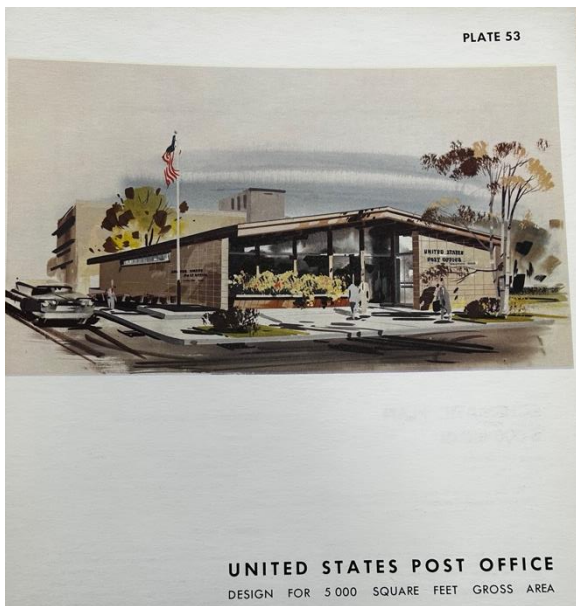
Thousand Series design drawing from Building Design Guidelines. Design 53 is distinct from other design plates at it is one of the few designs with a front gabled roofline. Design 53 also has vertical picture windows and door in the recessed entrance. The materials still revolve around the use of brick veneer (USPS Corporate Library, 1959).
